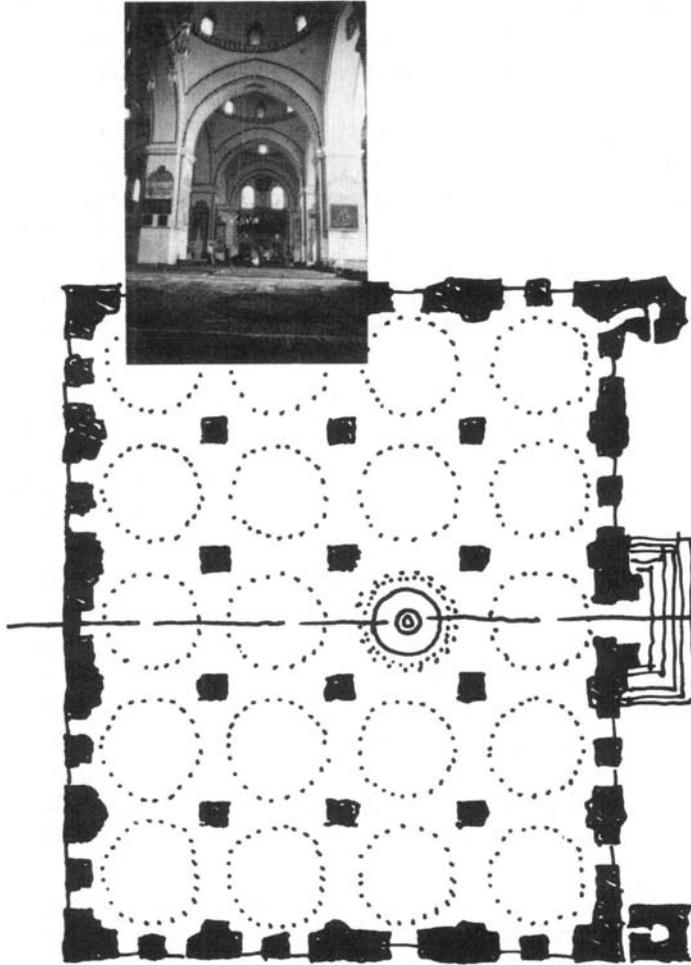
Interior photograph and floor plan sketch of Ulu Cami and dome location in Bursa.
